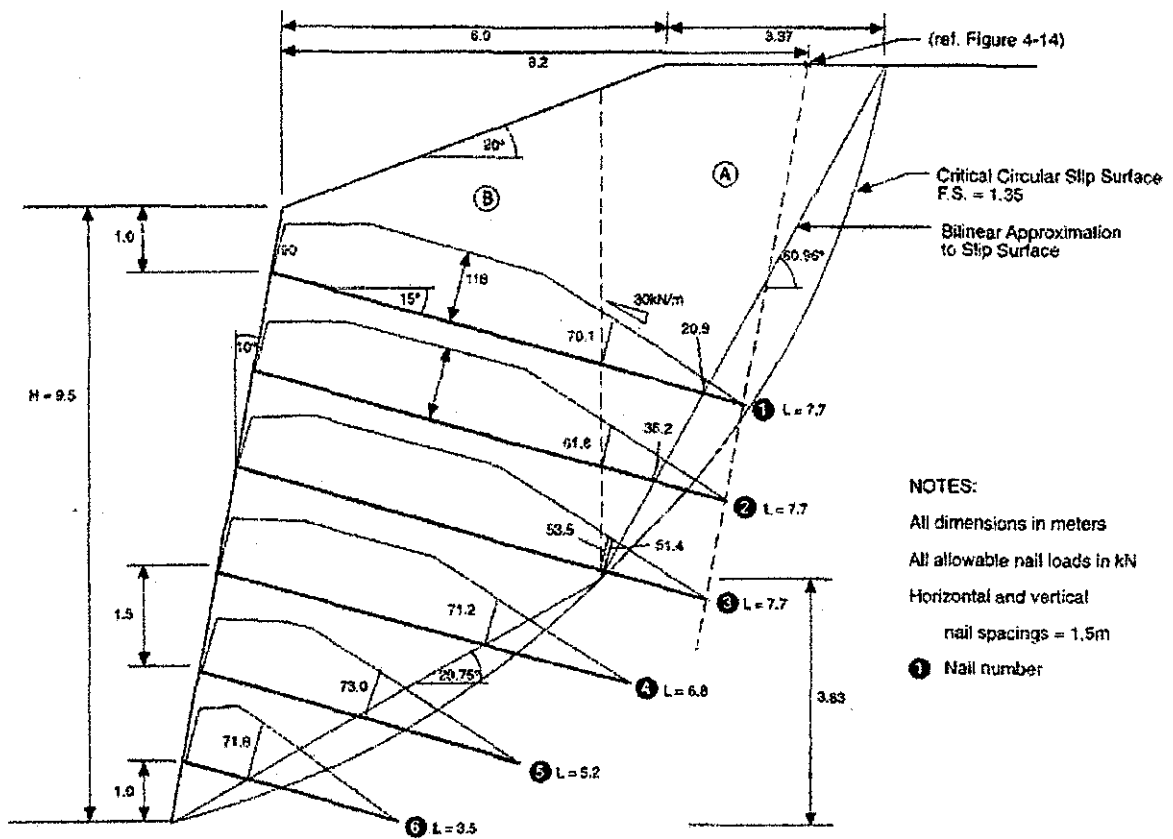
Cutslope Design Examples Trial design Critical Cross Section Static Loading (from FHWA 1998)
